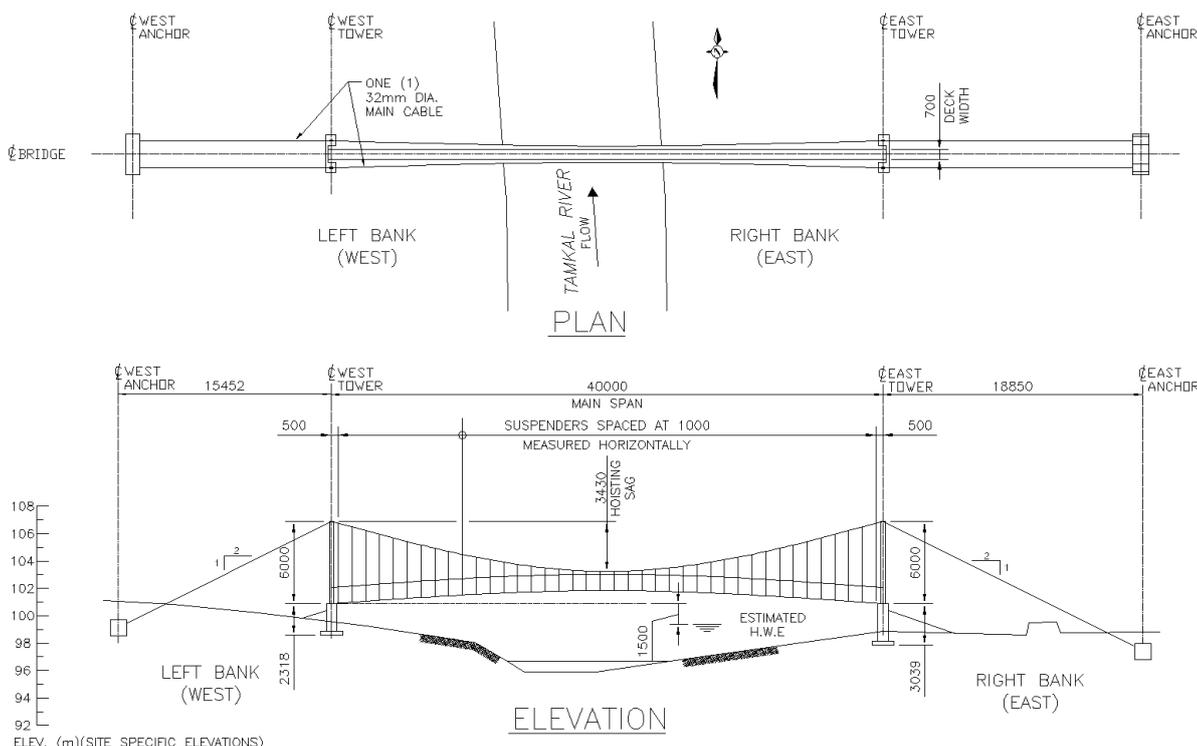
Plan and Elevation of the 40m Suspension Bridge at Tamkal
